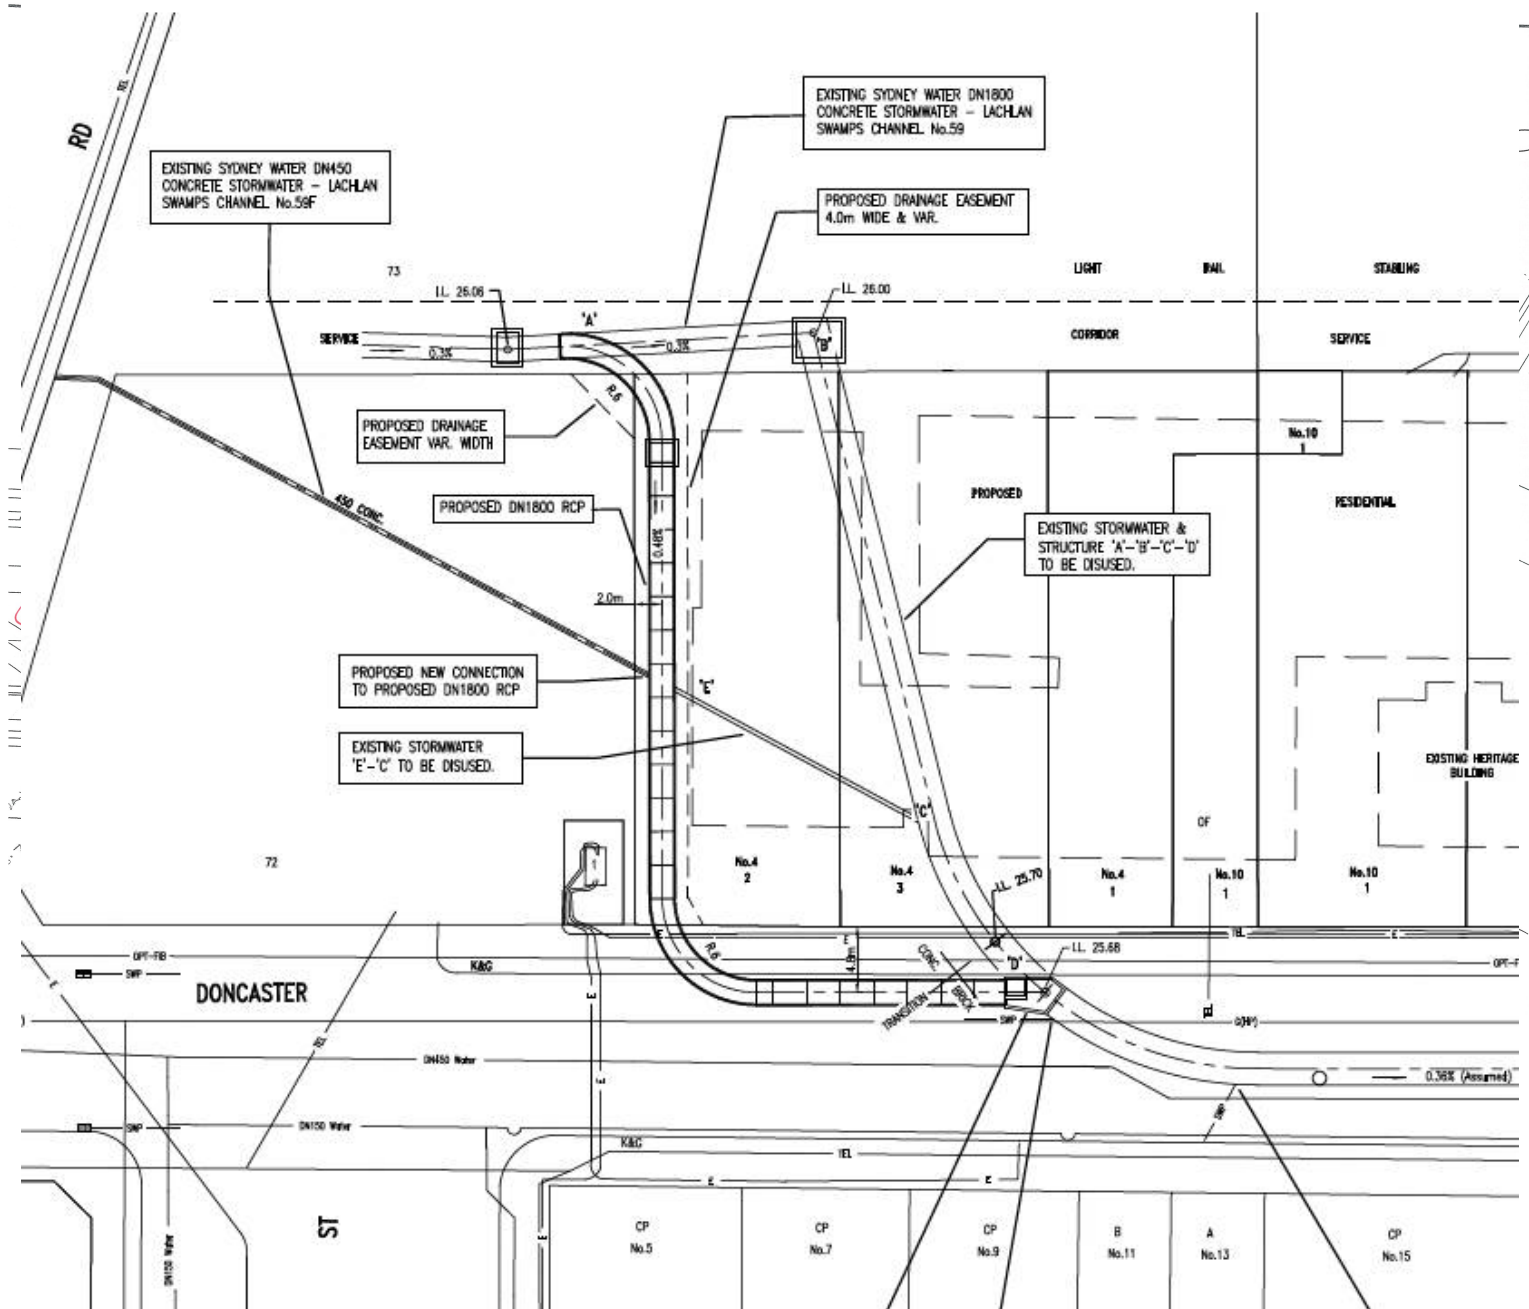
Shows the locations of both the existing and proposed stormwater pipe.
